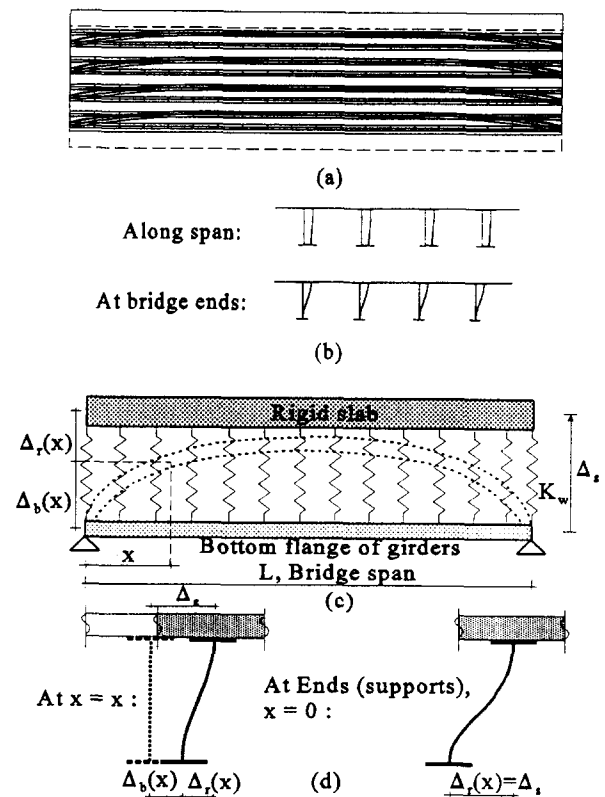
SAP90 Deformed Shapes for Typical Bridges without Diaphragm: (a) Plan View; (b) Side Views and Schematic of Simplified Model without Diaphragm; (c) Plan View; (d) Side Views
